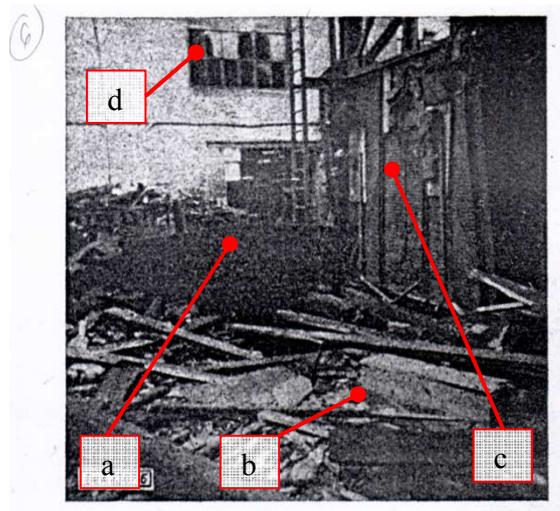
The inside of #2 Shaft House, facing south. Legend: a) steel deck plate bent upwards; b) snapped construction timber; c) side of the cage structure; d) intact window frames (photo from Junghans 1953b).
